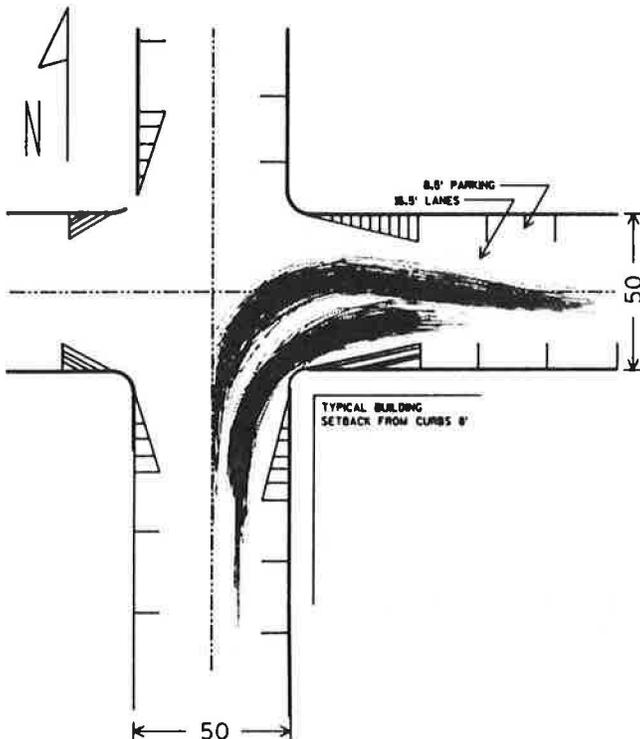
Offtracking/encroachment for 50-ft width approaches (note room available for opposing traffic to bypass encroaching trucks).
